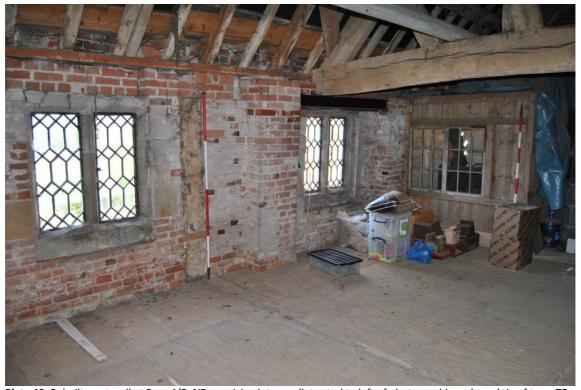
Rebuilt west wall at Bays 4/5; NB: surviving intermediate stud to left of photographic scale and tie of truss T5 supported on paired RSJs over inserted window.
